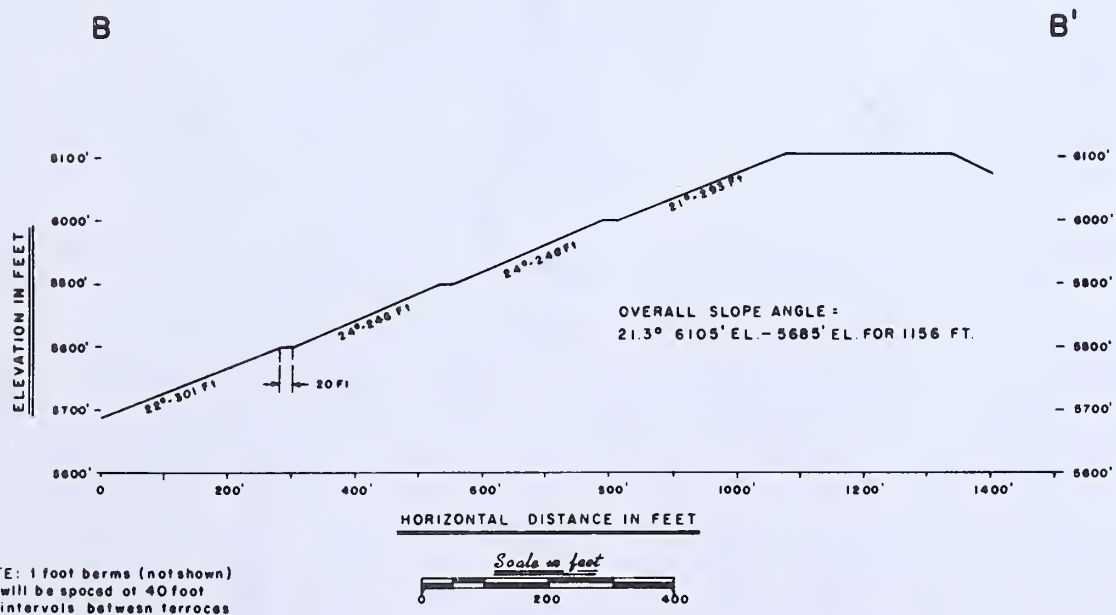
Planned south dump profiles. Location of cross-sections is shown in fig. I-4.
